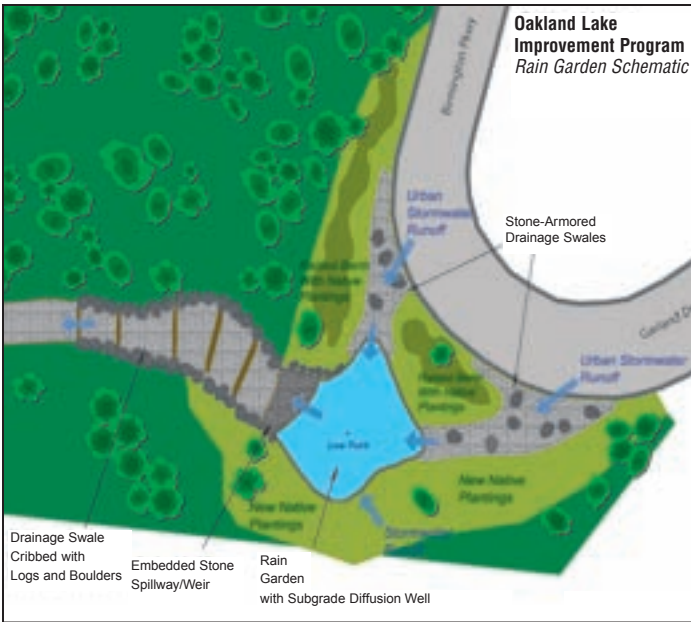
Bluebelt installations that include new bermed plantings and riverstone drainage swales surround the rain garden site to create an effective stormwater collection system.
